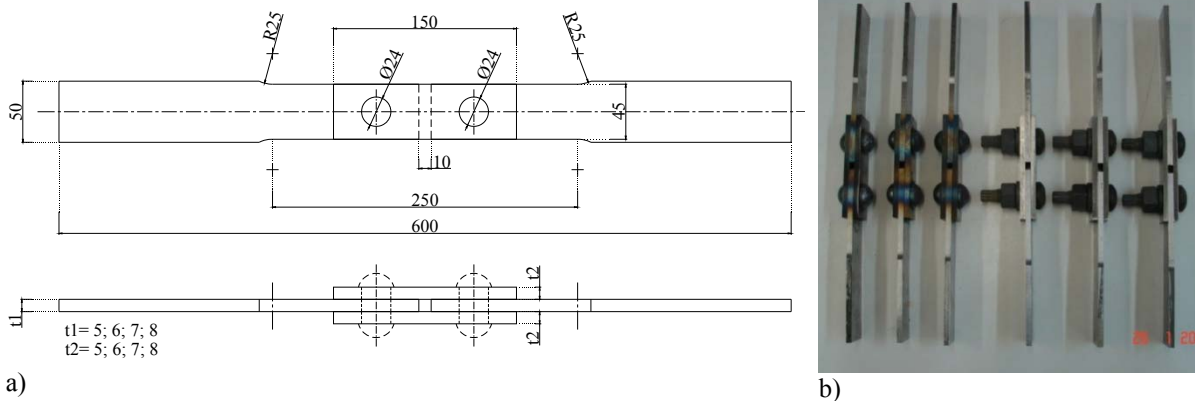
Riveted and bolted joint prepared with material from the Fão bridge: a) geometry of the riveted/bolted joint (dimensions in mm); b) photograph of riveted and bolted specimens.
